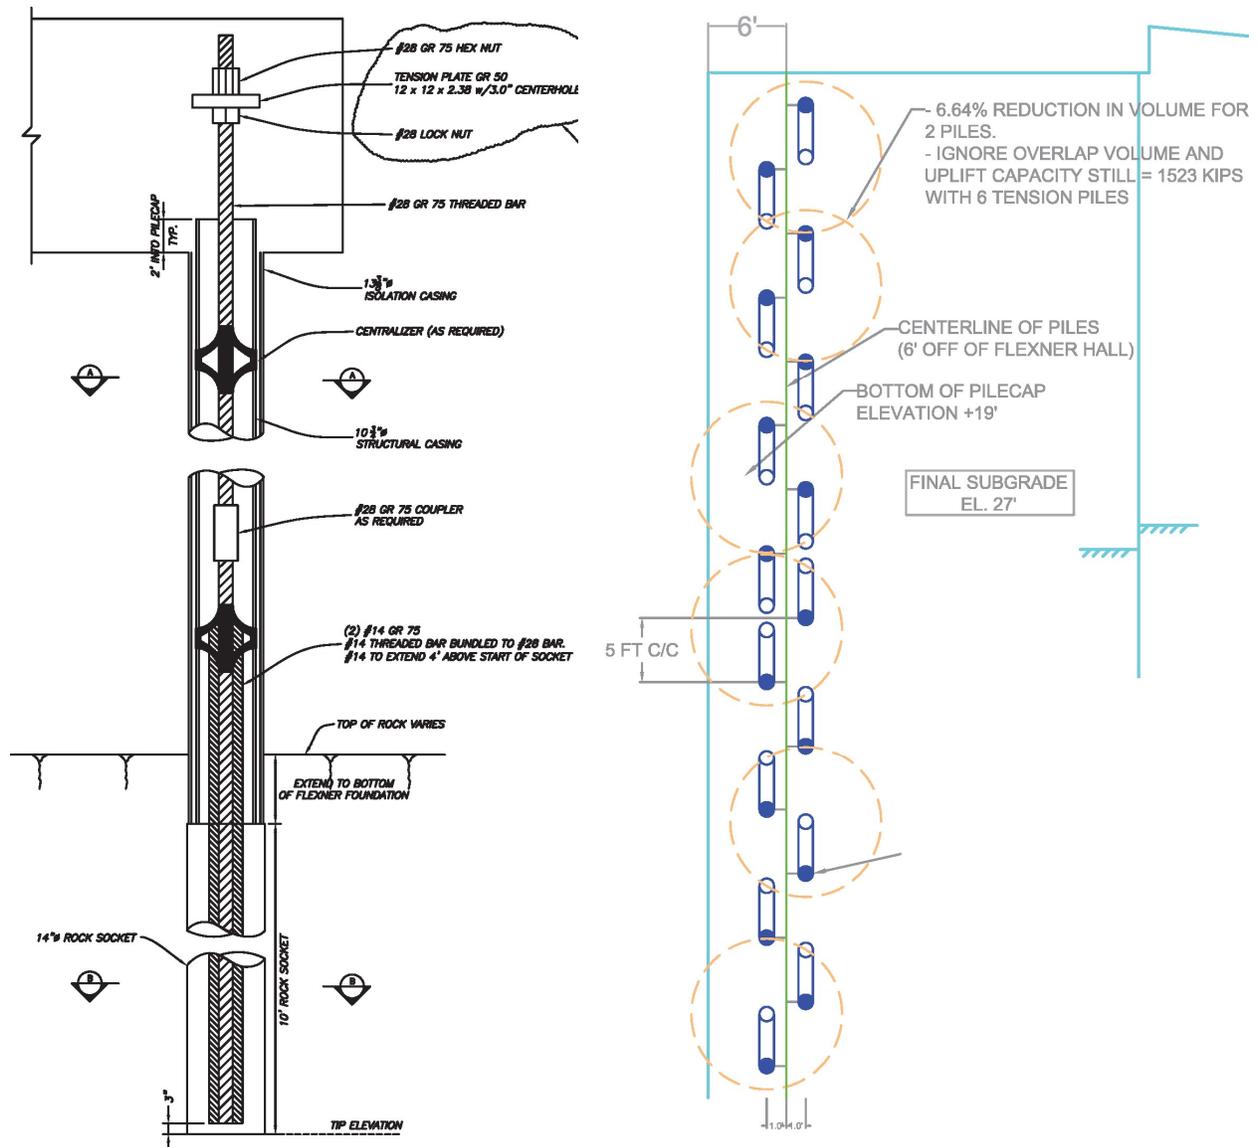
Pile layout and details for proposed alternate mini-caissons in lieu of the MER A shear wall shown in figure 4B.
